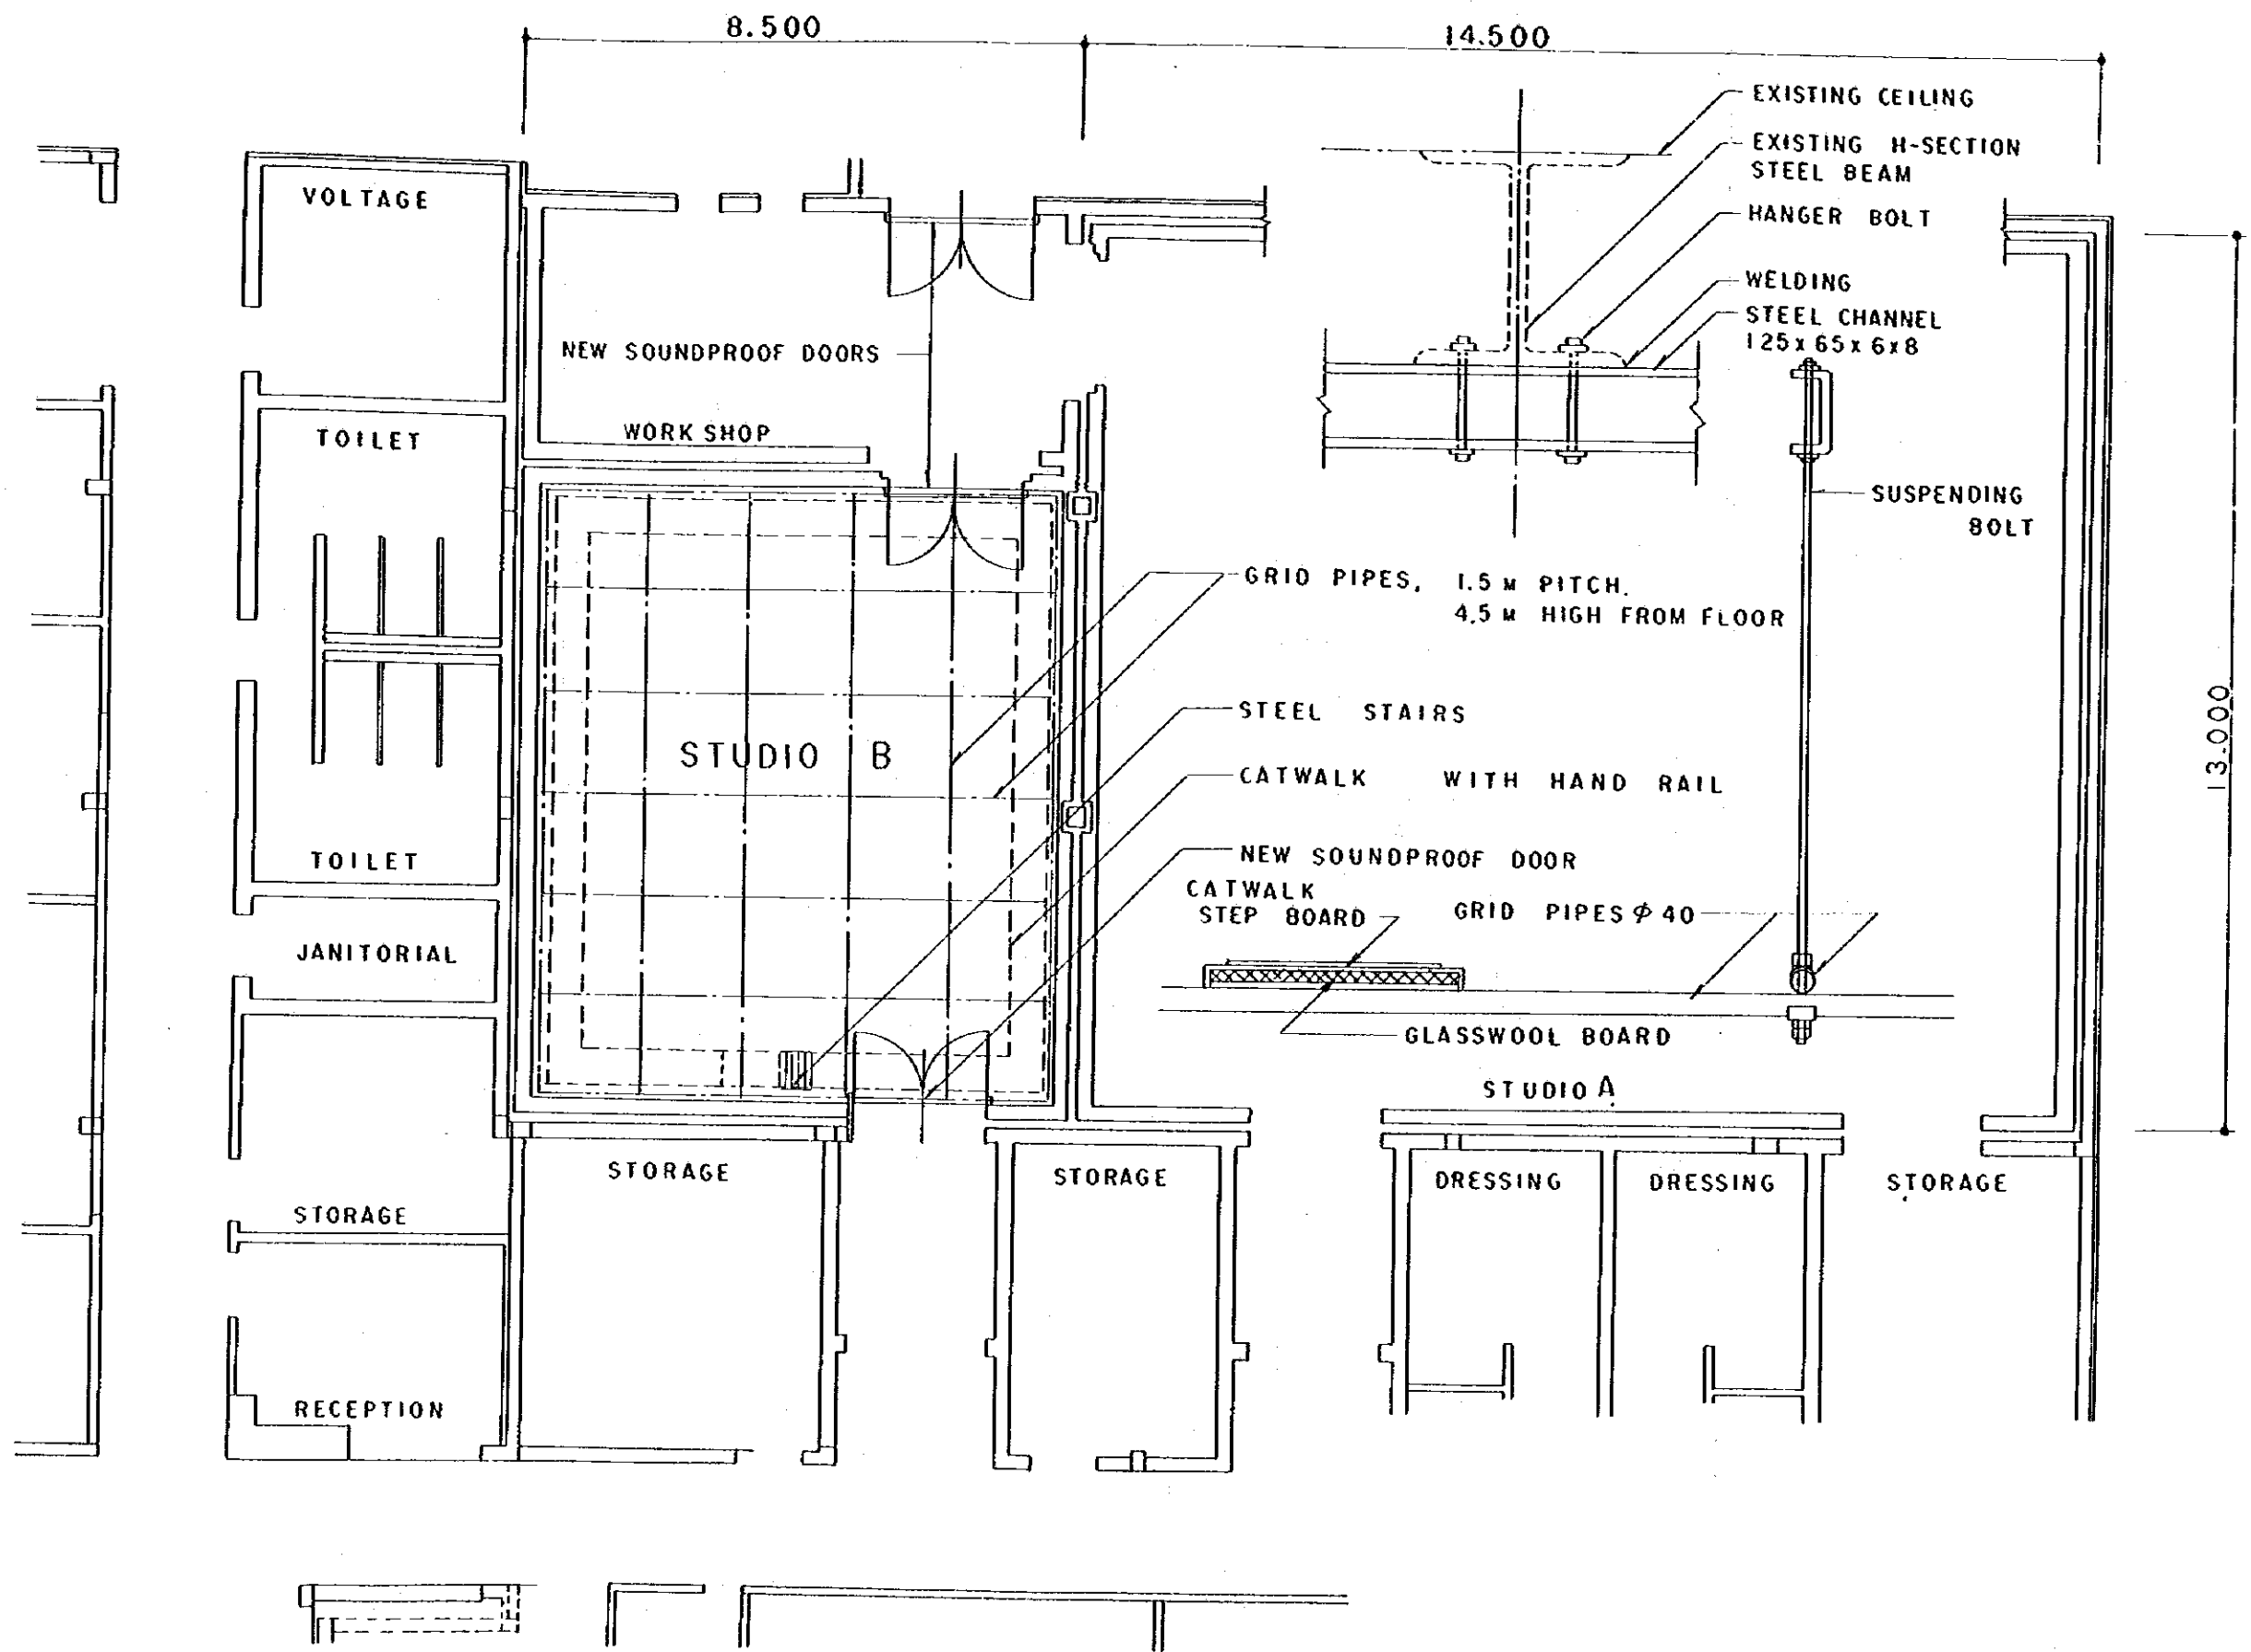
Studio B 1st Floor Plan (Monrovia)
